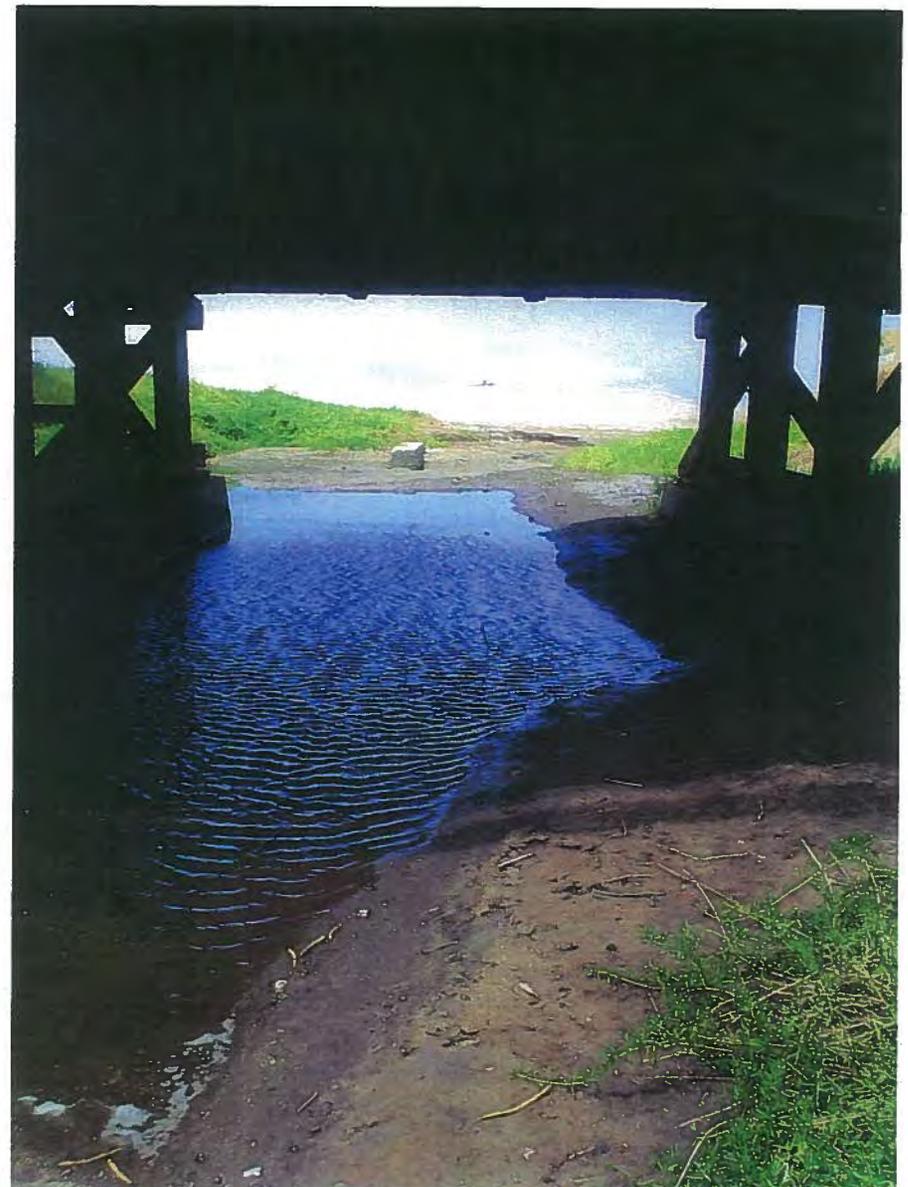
BRIDGE 3A - MAUKA SIDE FACING SOUTH
